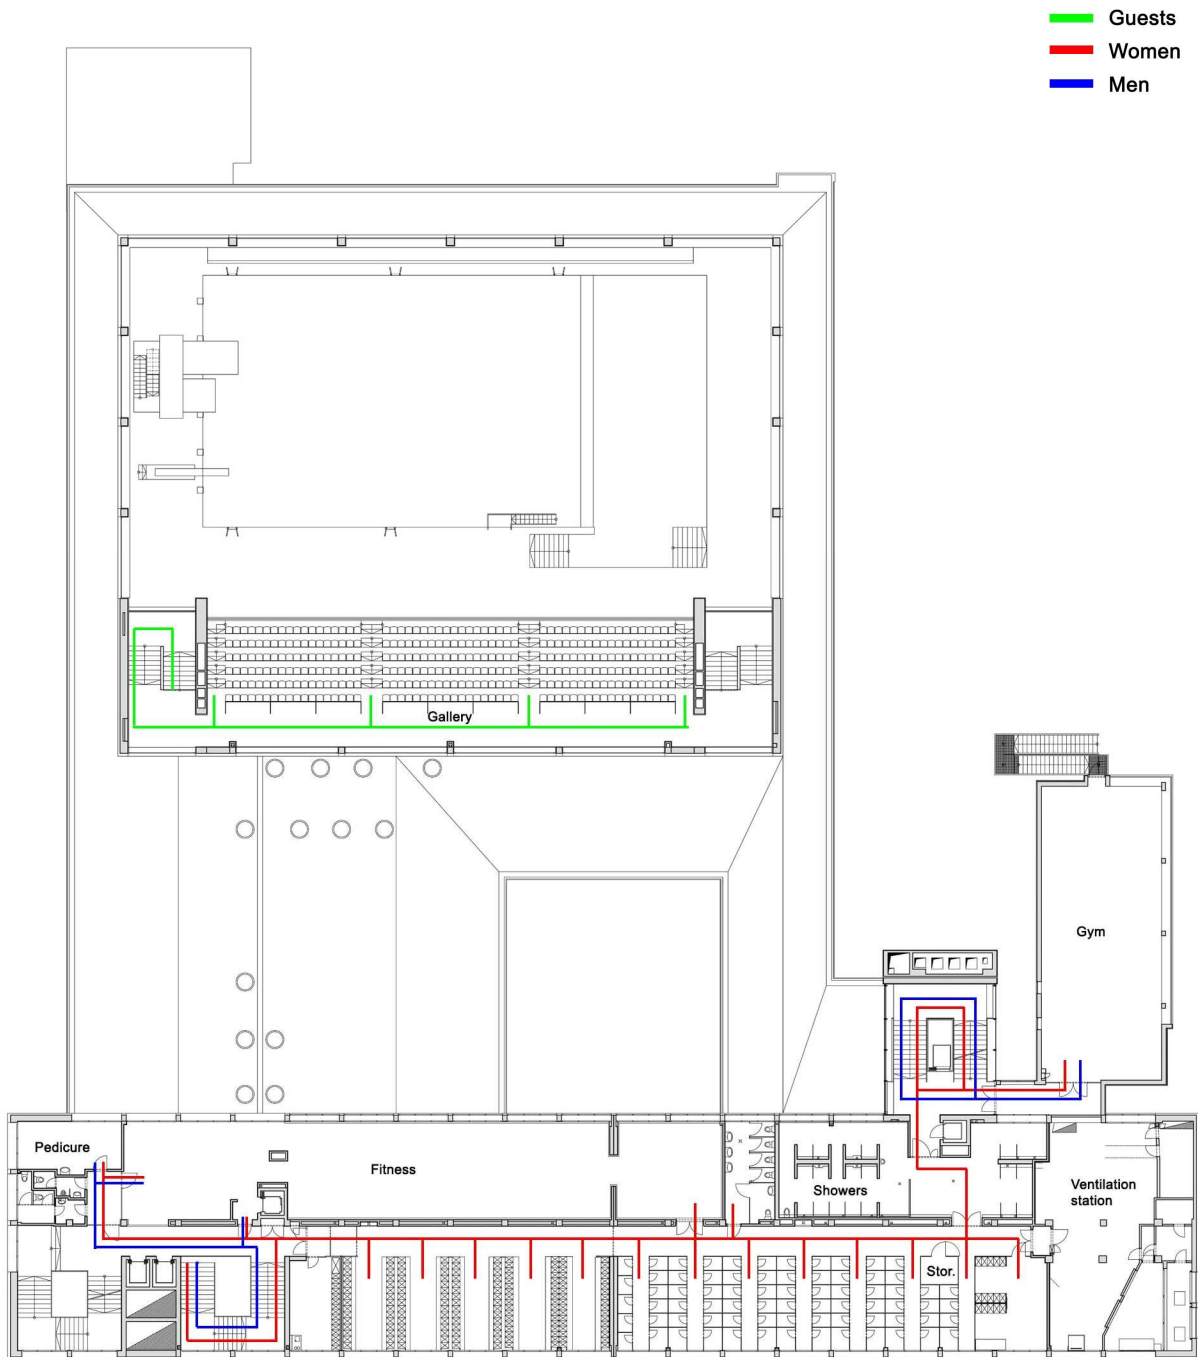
1<sup>st</sup> floor plan Floridsdorfer swimming hall 1:500 (source: MA 44, 2016/17)
